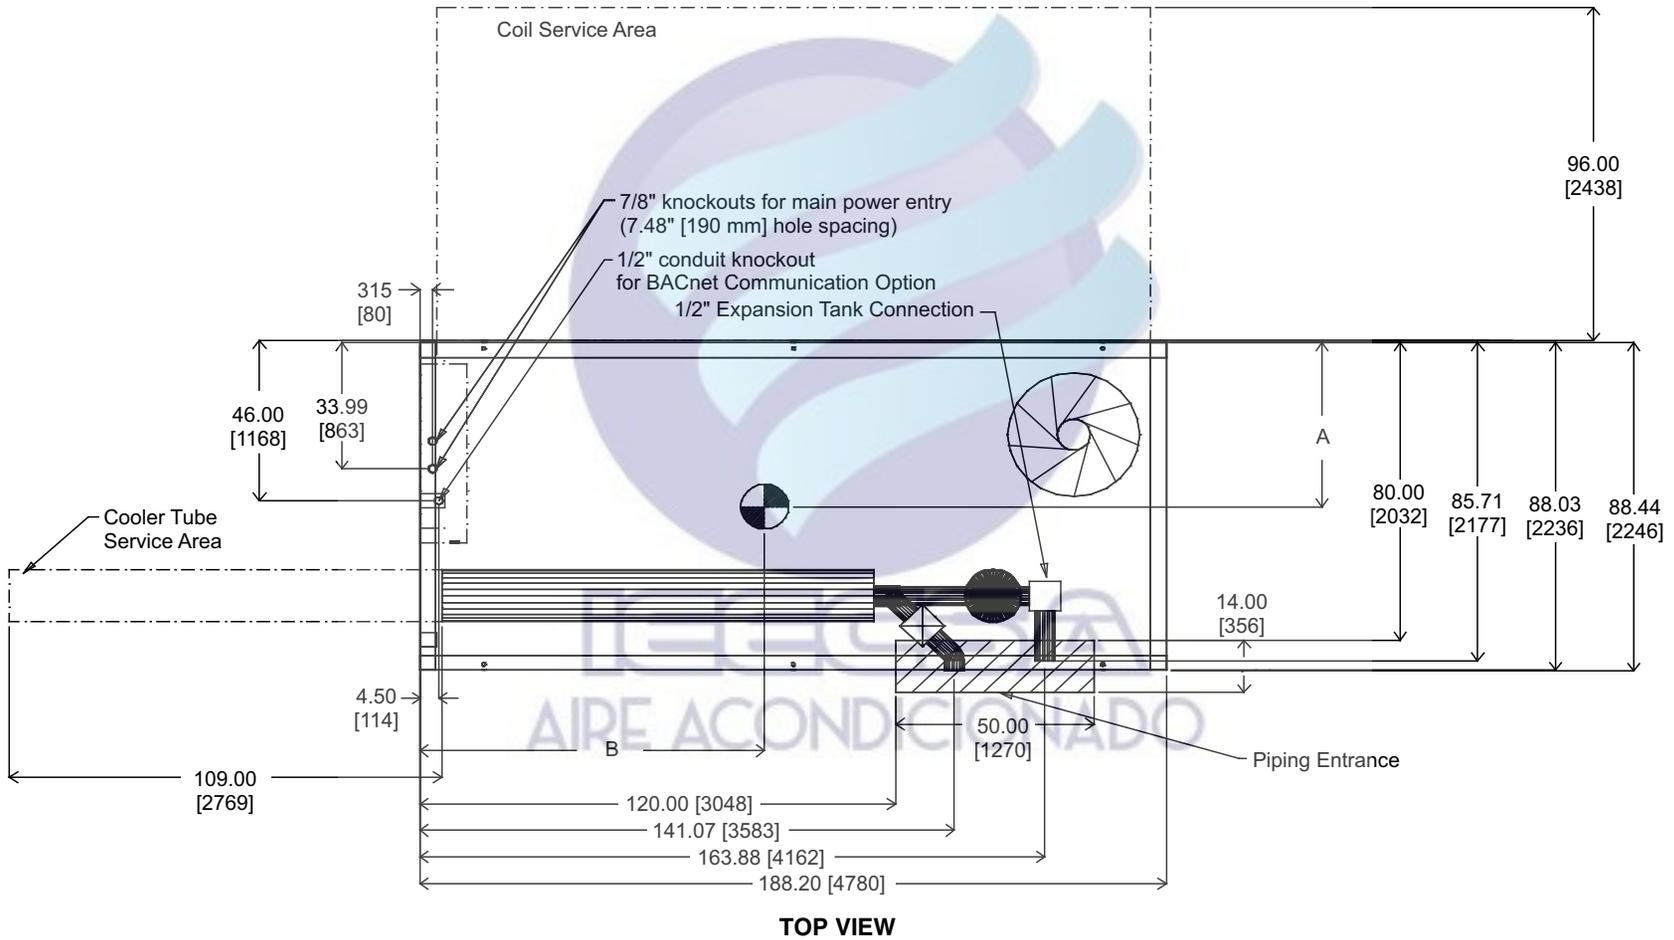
30XA090, 100, 110, 120 Air-Cooled Liquid Chiller Dimensions with Single Pump (See Note 4)
